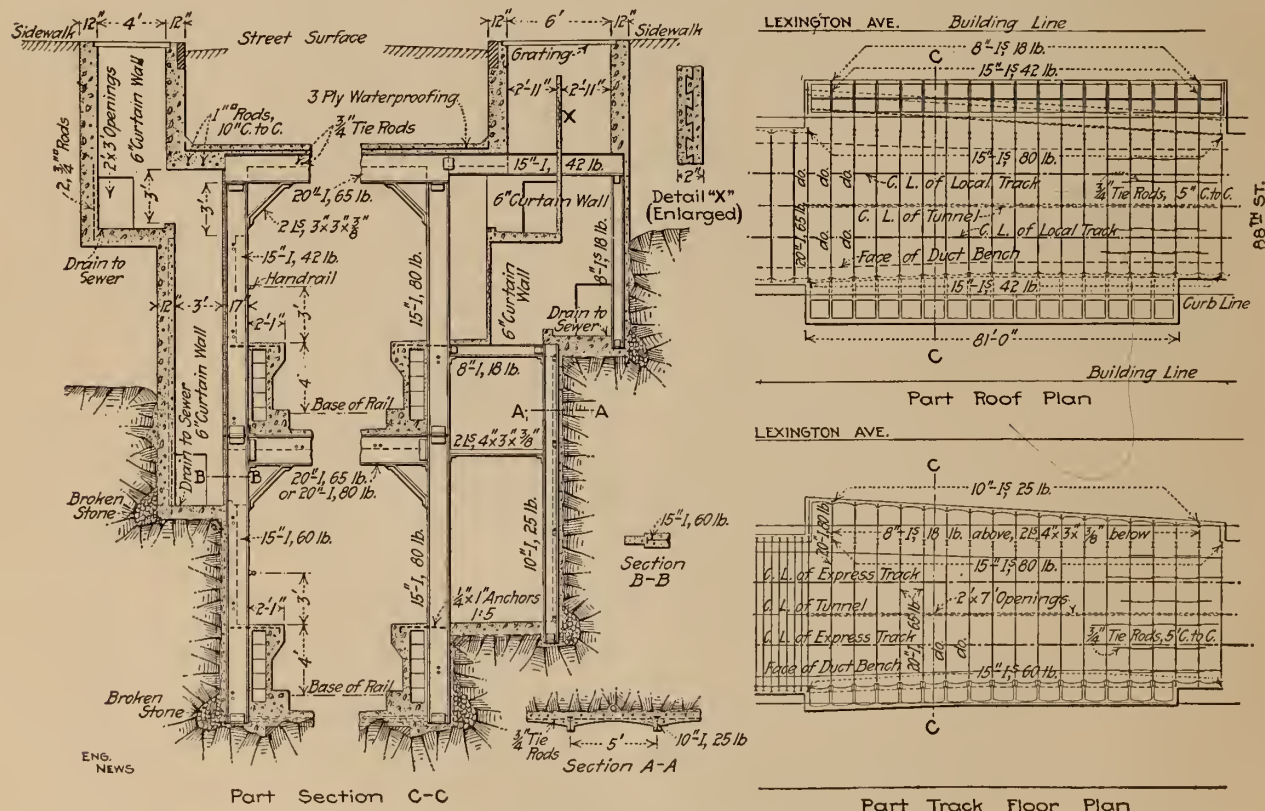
PARTIAL CROSS-SECTIONS AND PLANS OF DOUBLE-DECK SUBWAY, SHOWING TYPICAL ARRANGEMENT OF VENTILATING OUTLETS
